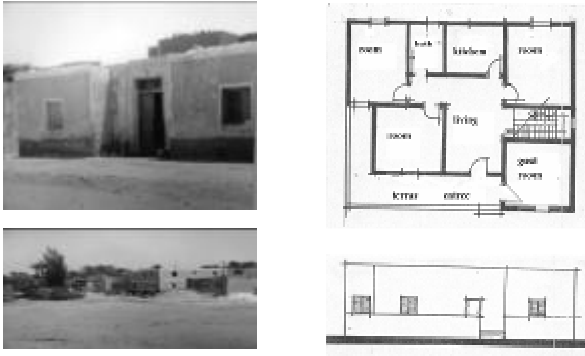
Example of a new house in Al-Qasr built by the owner (ground floor, and elevation) using concrete.
